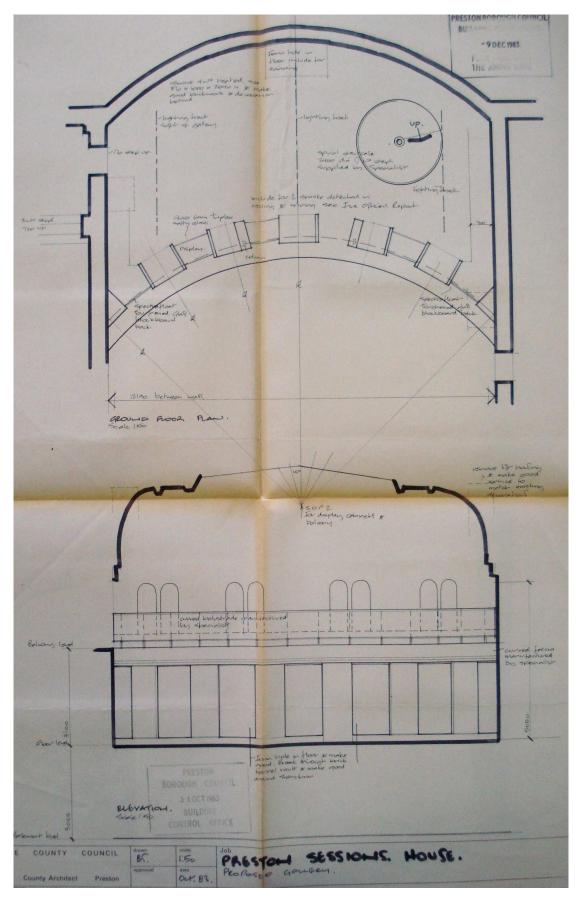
Section and elevation drawings of proposed conversion of Old Sessions House to Museum, 1983 (part two of two) (LRO LAU 6/4/11750)
